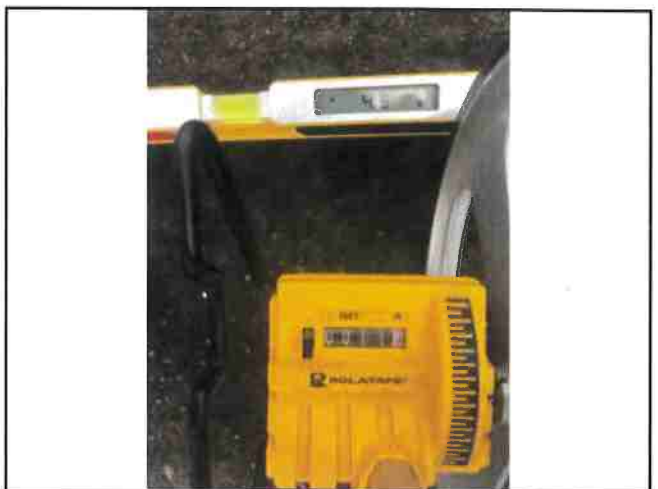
Private Access Rd Slope 4.9% Width 11'4"
